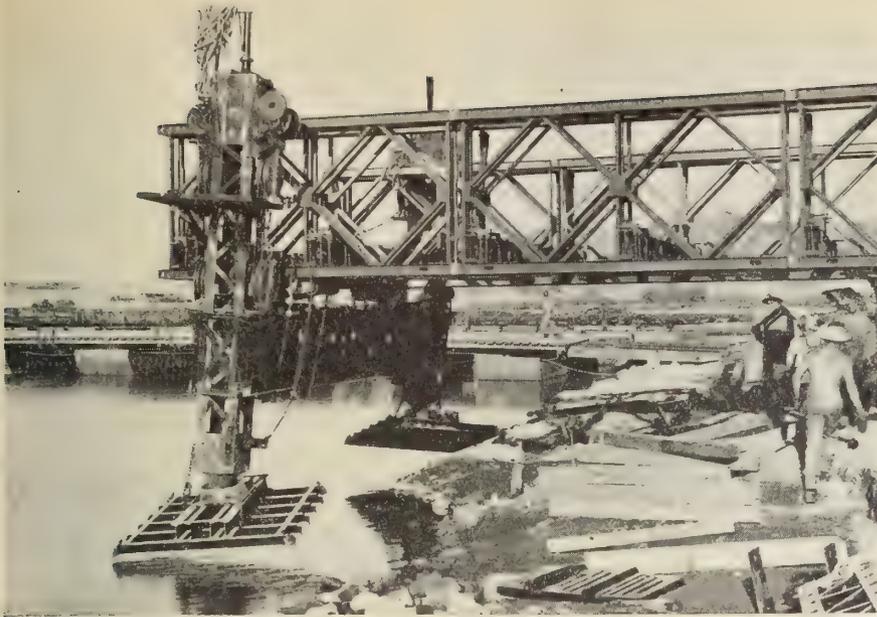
Launching has begun with one trestle suspended from the end of the bridge, and rolling forward is under way.
